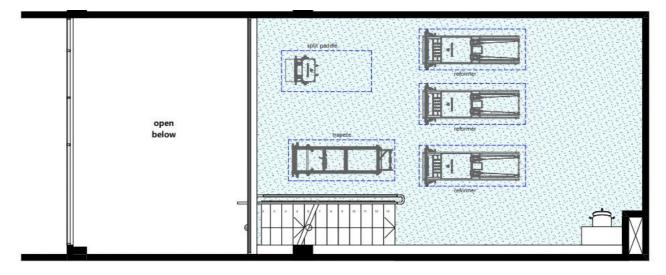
Existing and Proposed Mezzanine Level (Source: Council Approval Group)
